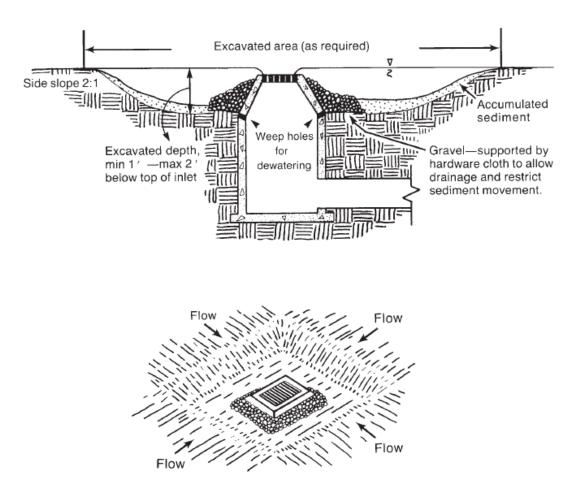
Excavated Inlet Protection (Source: NCDENR)
